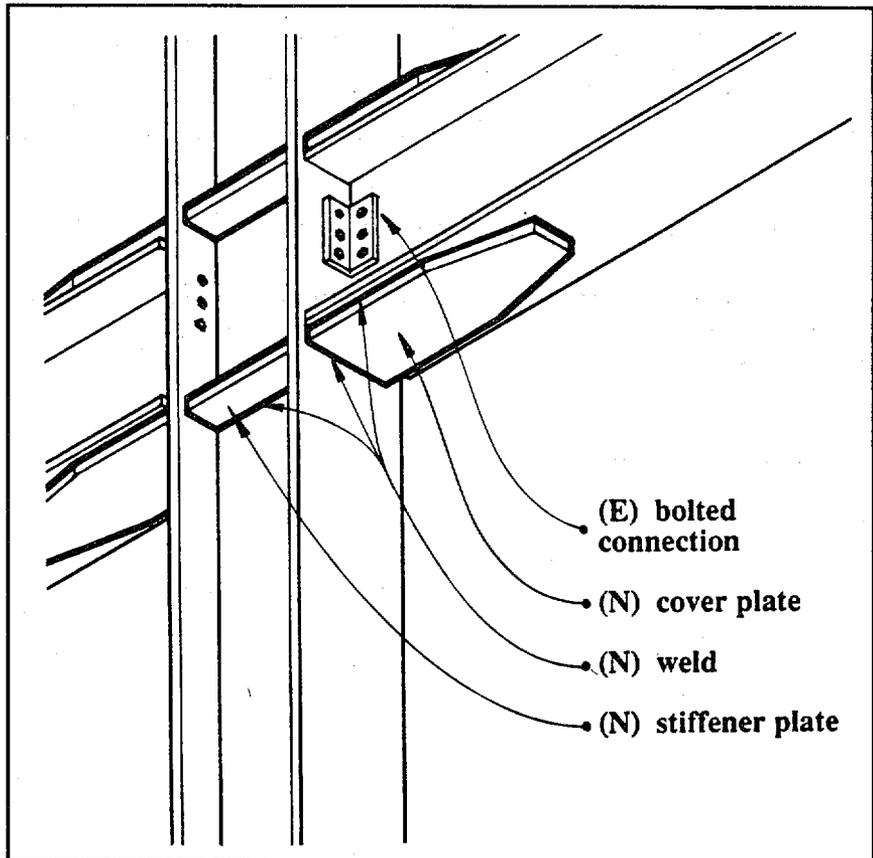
Modification of an existing simple beam to a moment connection.
